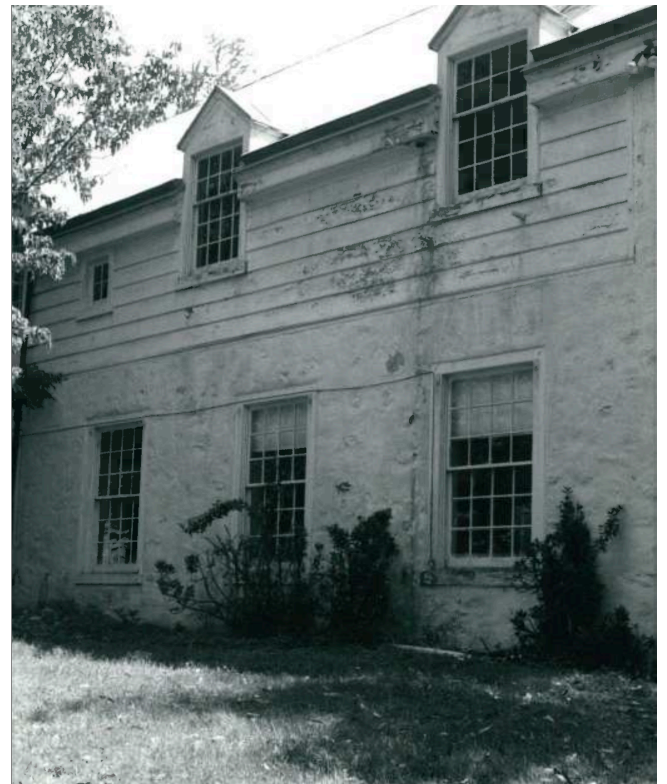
The west side of the 1932 addition showing the clapboard and stucco on stone construction as well as dormer windows that break the roofline. Photo by Dave Broida in 1979.
